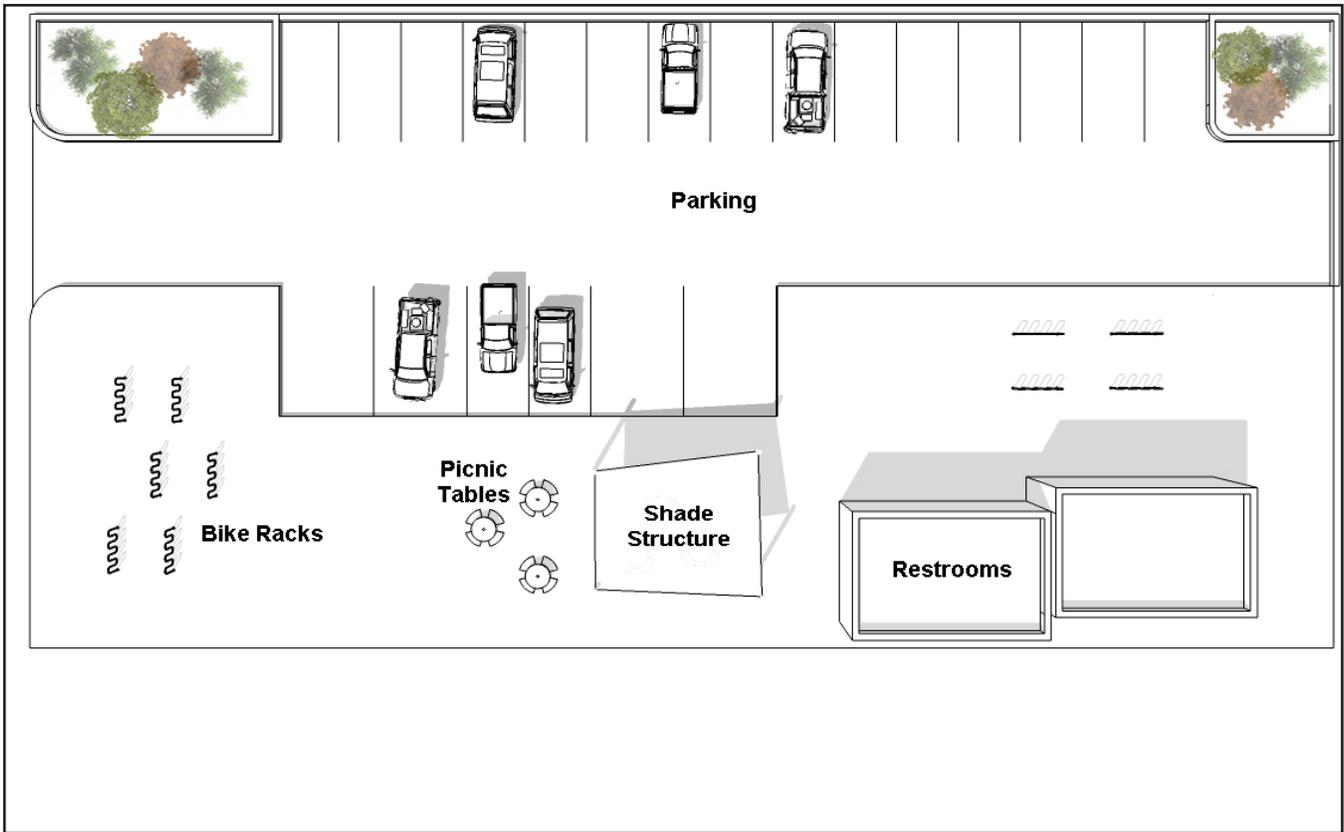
1: Proposed Bike Launch Site Conceptual Plan
